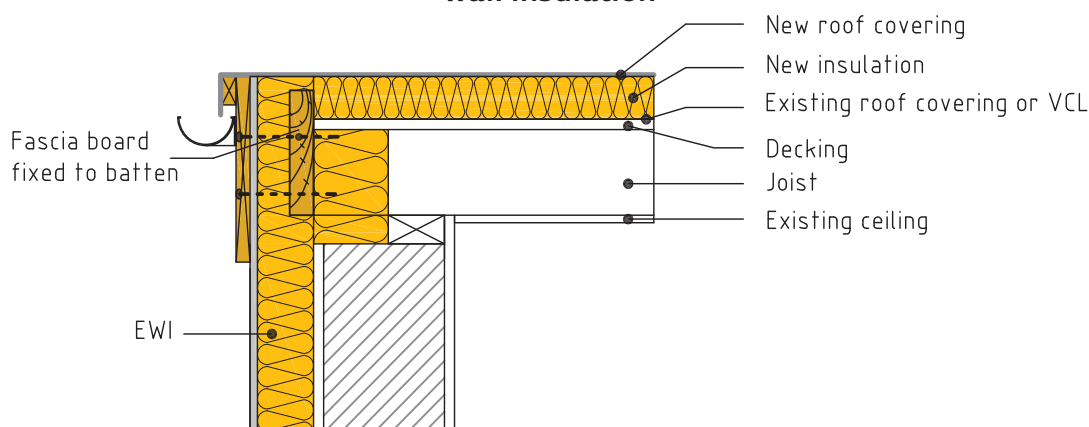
Warm deck with insulation replaced and external wall insulation, or conversion of uninsulated cold deck roof to warm roof
